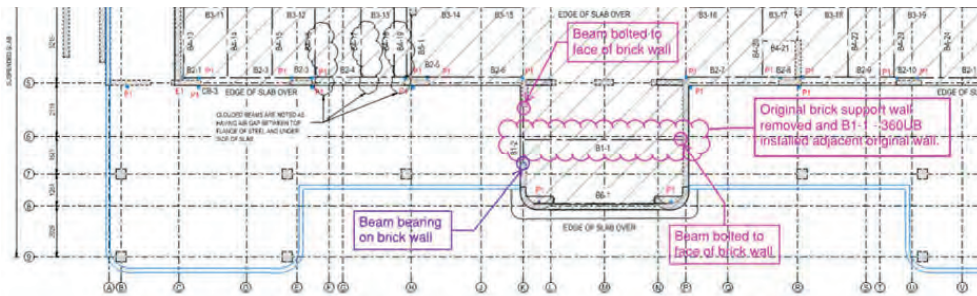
plan excerpt highlighting connections to the face of brickwork.
